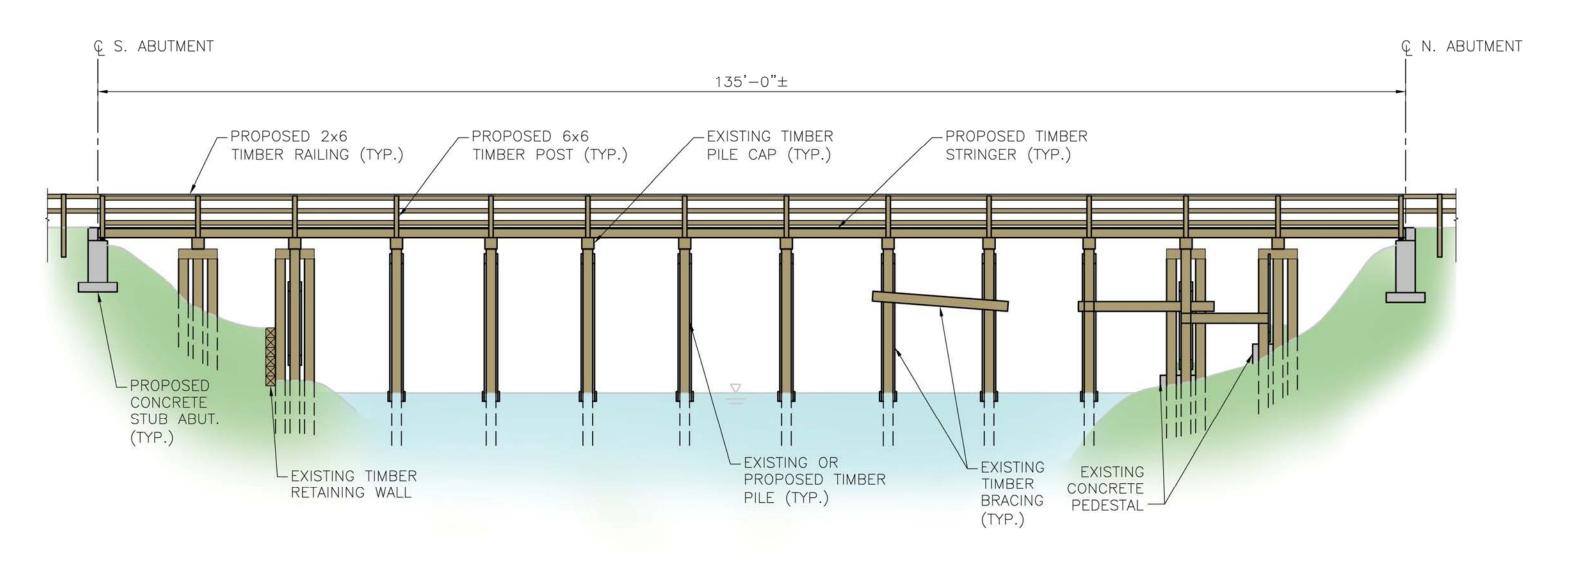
Alternative 1 – Rehabilitation of Existing Bridge Structure Elevation View
